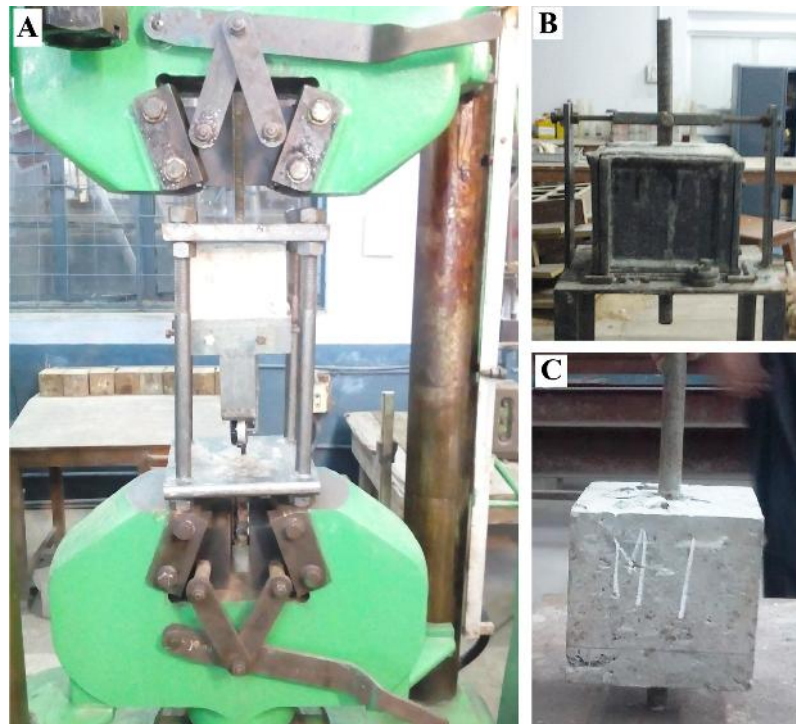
Test setup for bond behaviour: (A) testing machine; (B) specimen mould; (C) failure sample.
